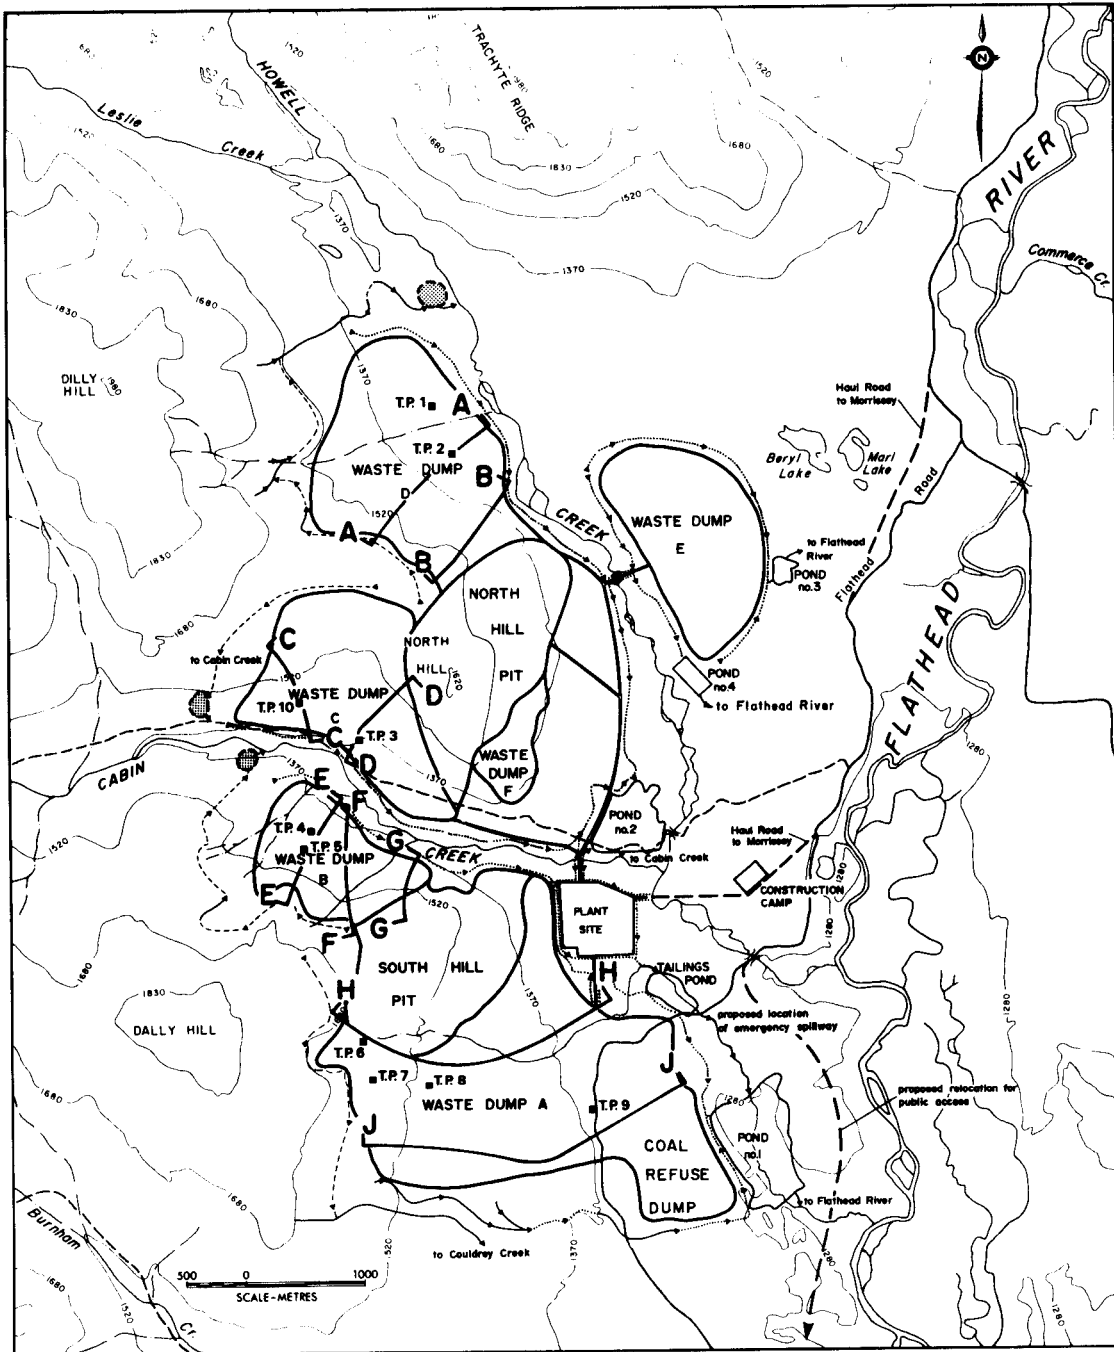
Site plan showing waste dump cross-sections (e.g., G-G) and test pit locations (e.g., T.P. 7).
